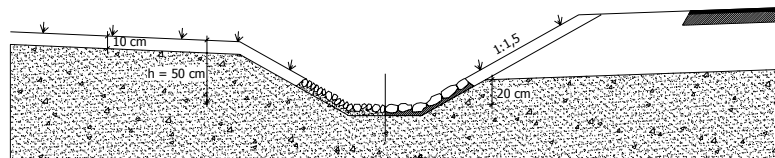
Protection of cross-section of trapezoidal ditch with turf paving or quarry-stones (on a layer of sand or cement concrete blinding) for longitudinal slopes of  $J = 3\%$  to  $10\%$
